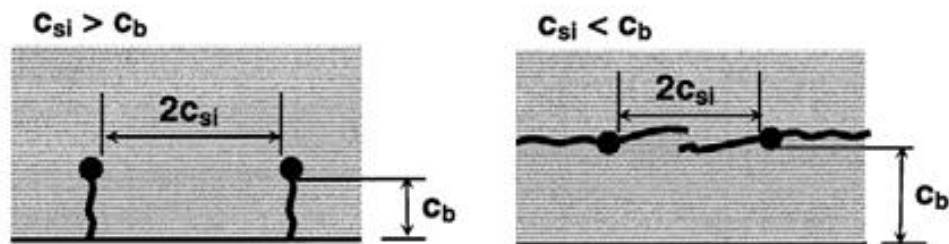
Splitting type bond failure (El Maaddawy, 2004)
